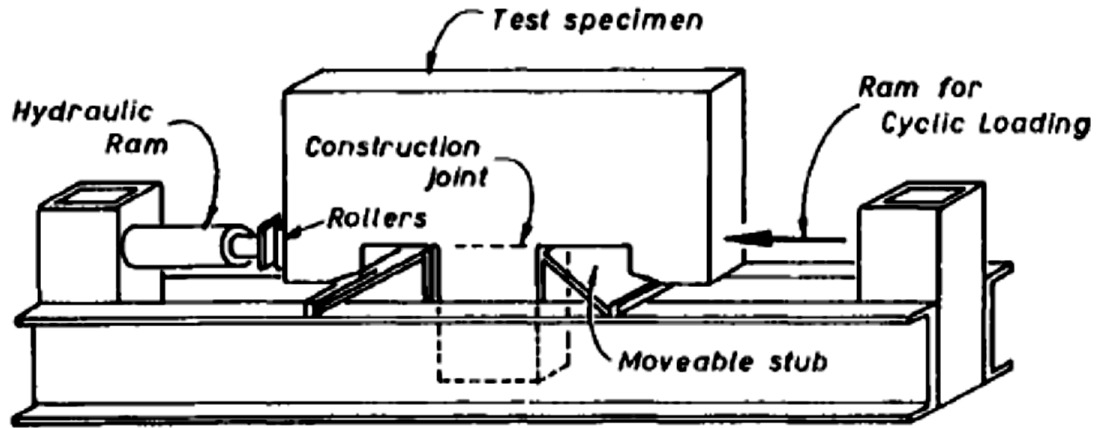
Test specimen and setup (Paulay et al. 1974)
